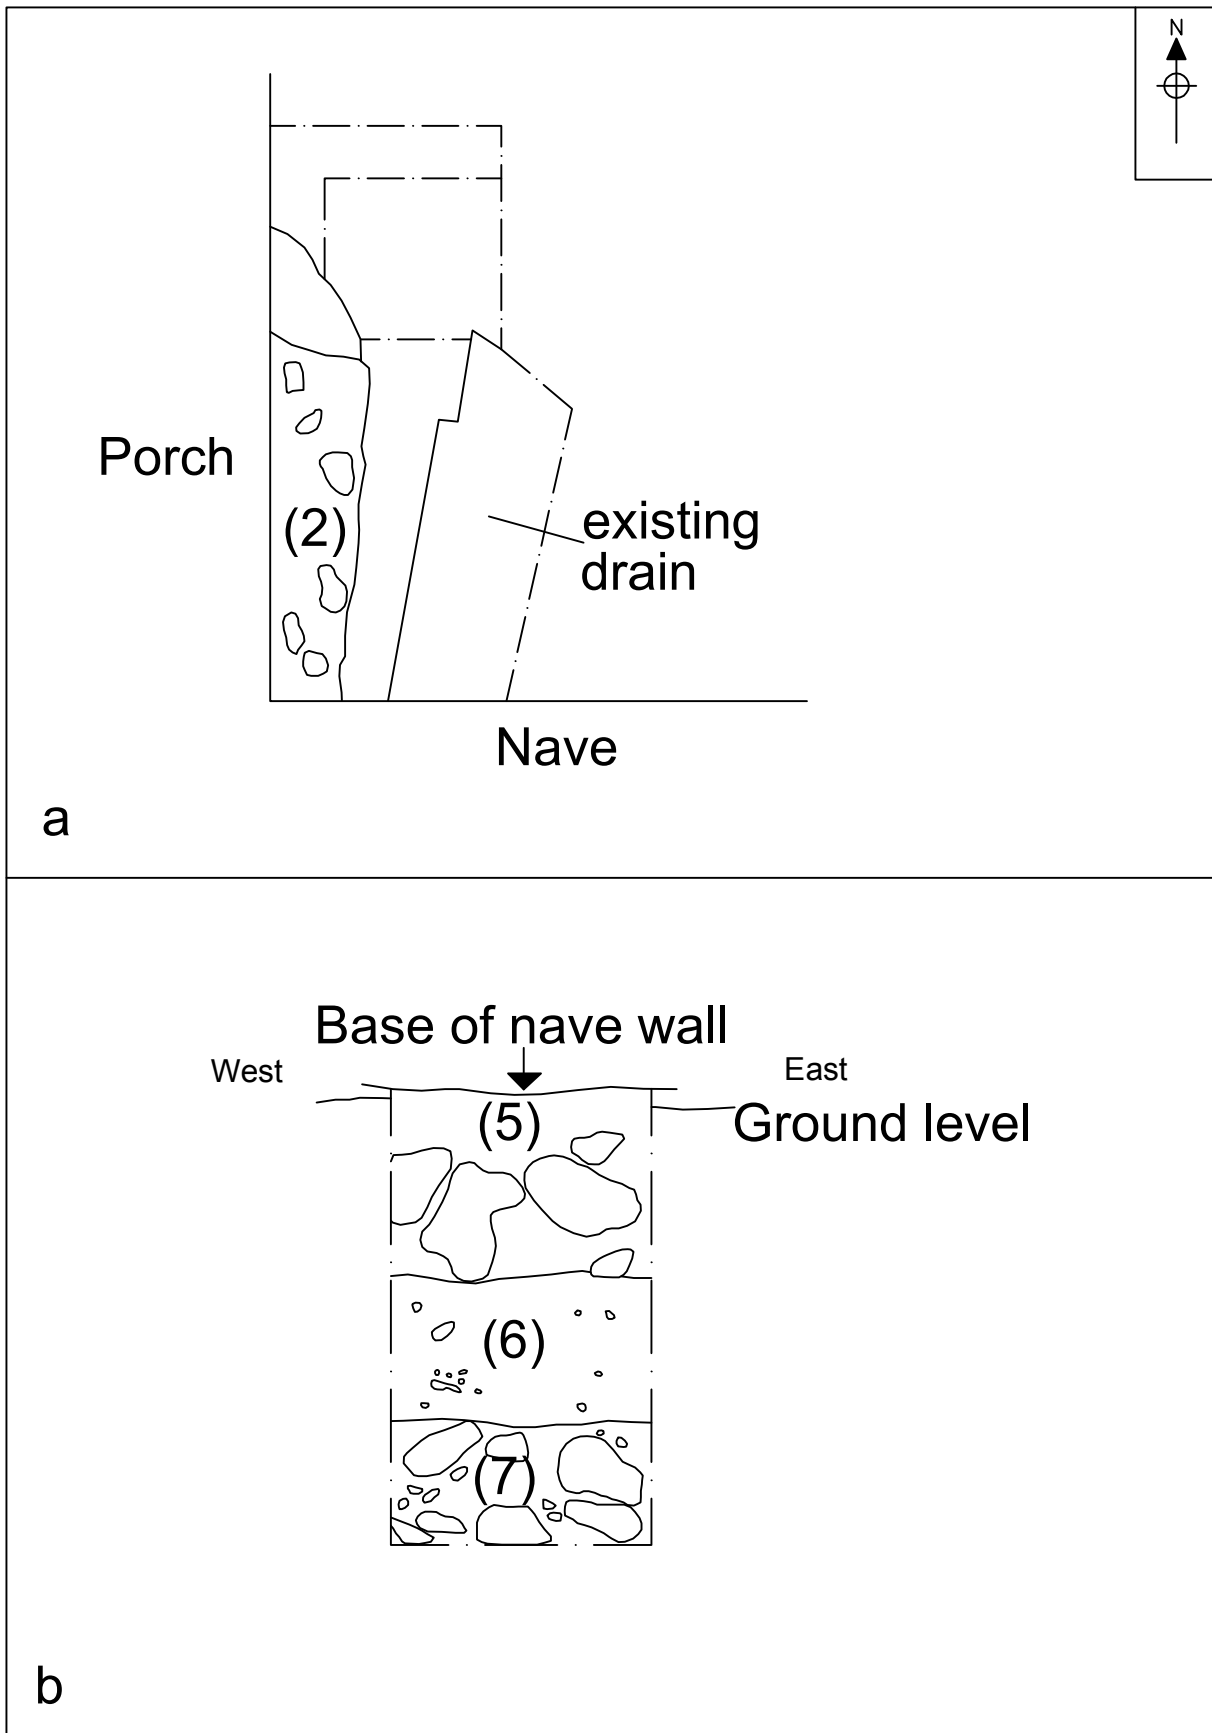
a: Plan of Trench [1] showing footing (2). Scale 1:20.
